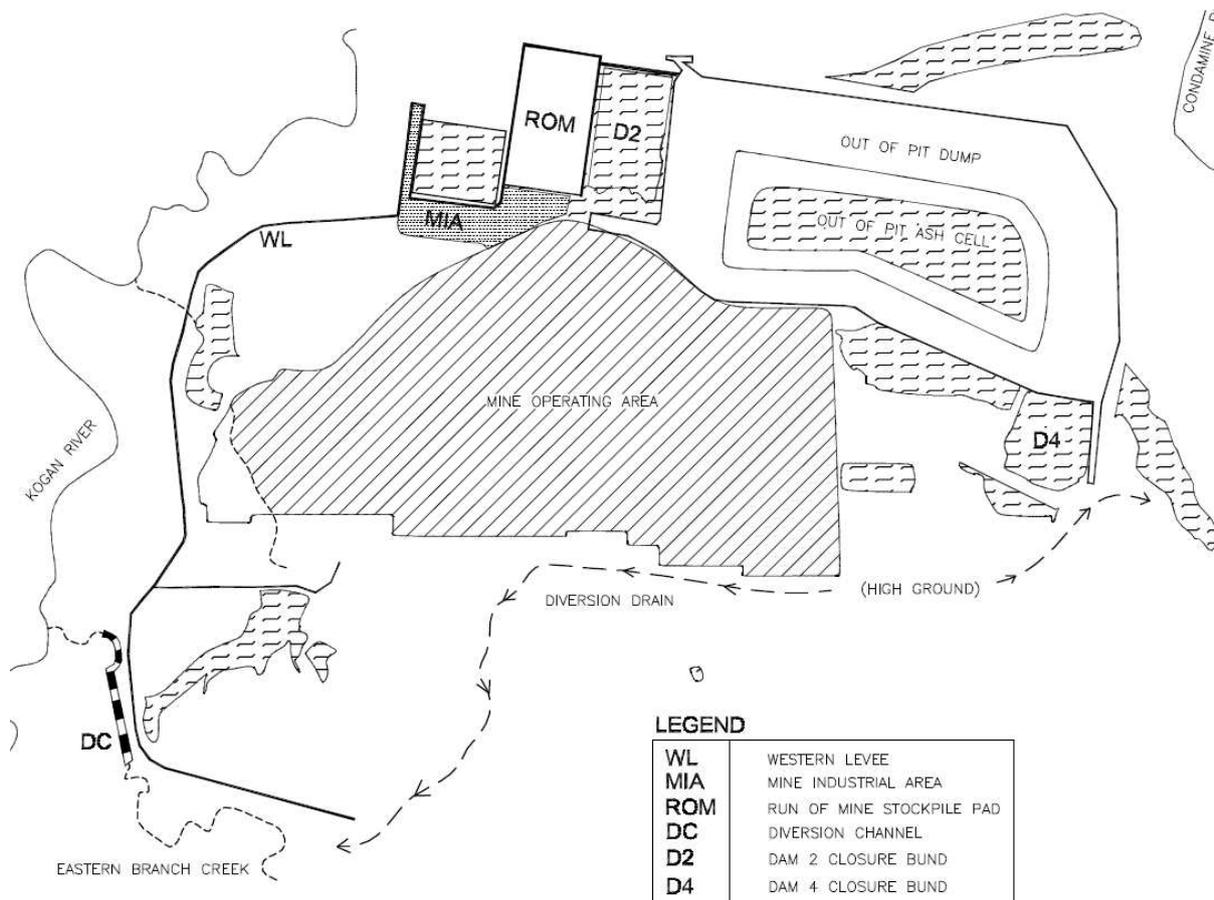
Schematic plan showing elements of Kogan Creek Mine flood exclusion system
